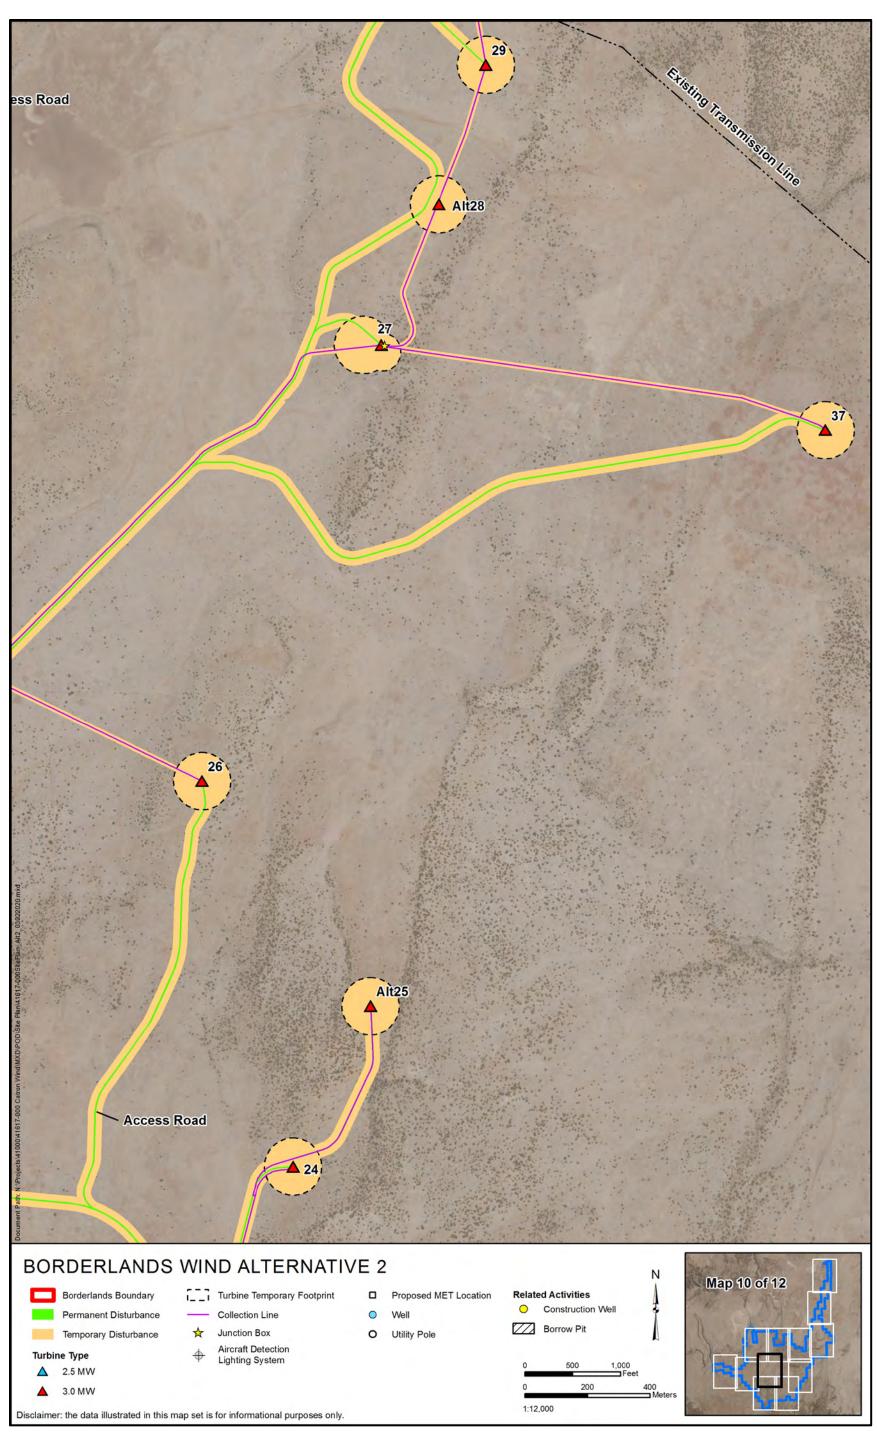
Alternative 2 Site Plan (Map 10 of 12)
